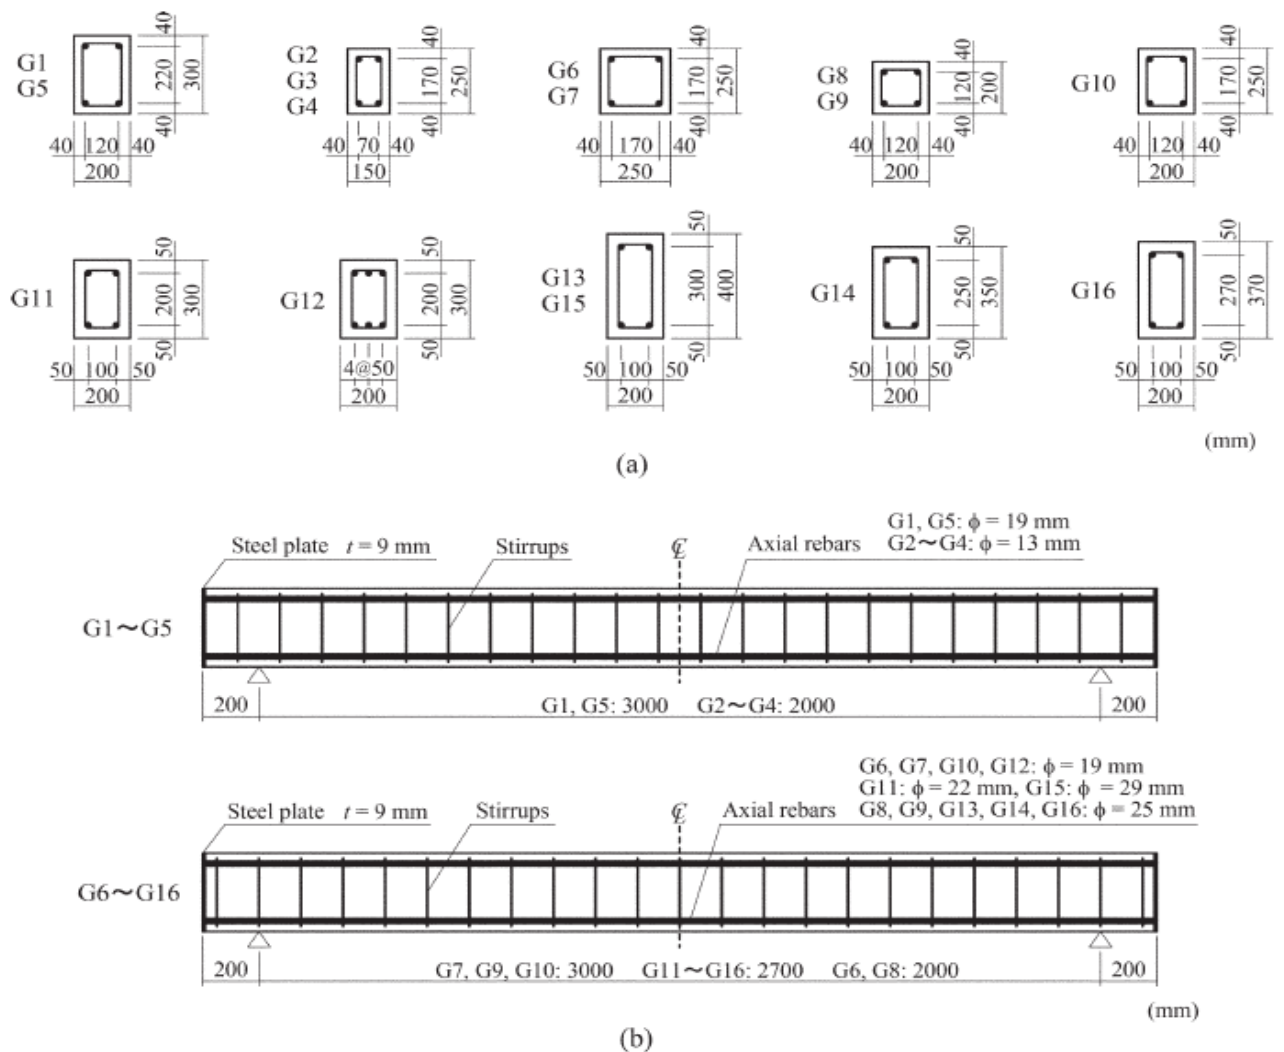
Details of beams of each series: (a) cross section of beams; (b) reinforcement layout of beams (Kishi, et al., 2012).
